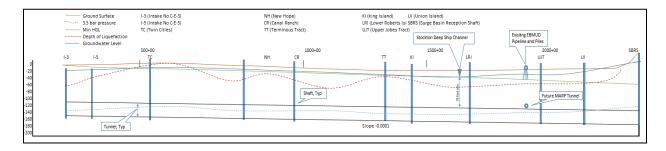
EPR Tunnel Profile between Intakes and Surge Basin
